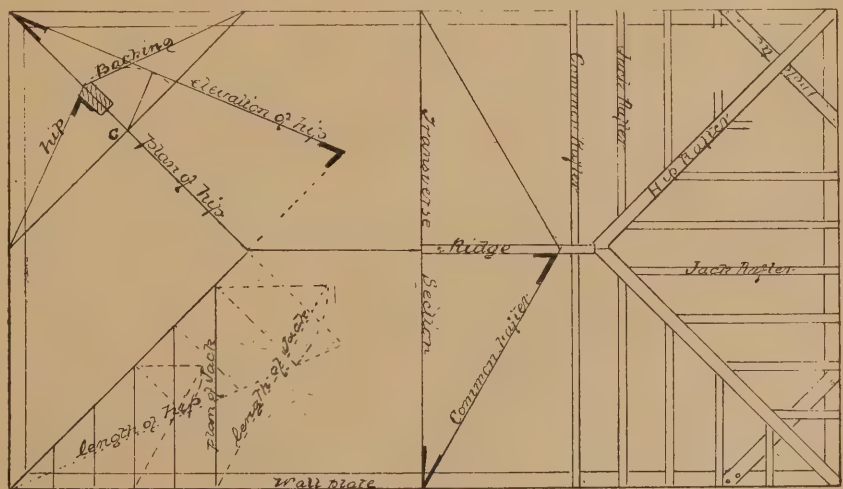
PLAN DIAGRAM OF HIPPED ROOF.
